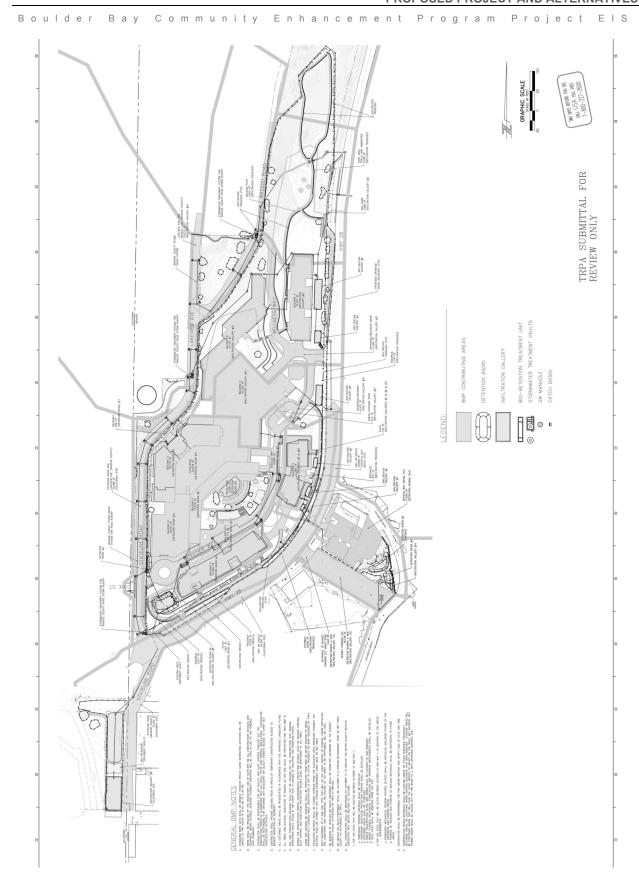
Proposed Project Water Quality and BMP Plan
